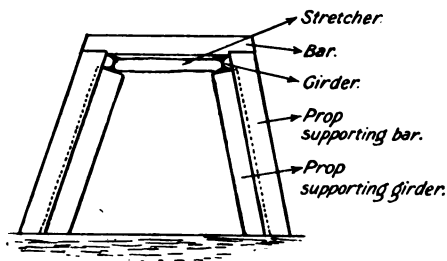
A Method of Timbering a Roadway driven through "Heavy" Ground.
